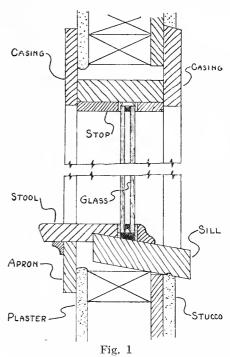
shows a simple design for a picture window frame for a frame building with stucco on the outside. The frame can be used with other outside wall finishes, without much modification, if any. Fig. 2 shows
